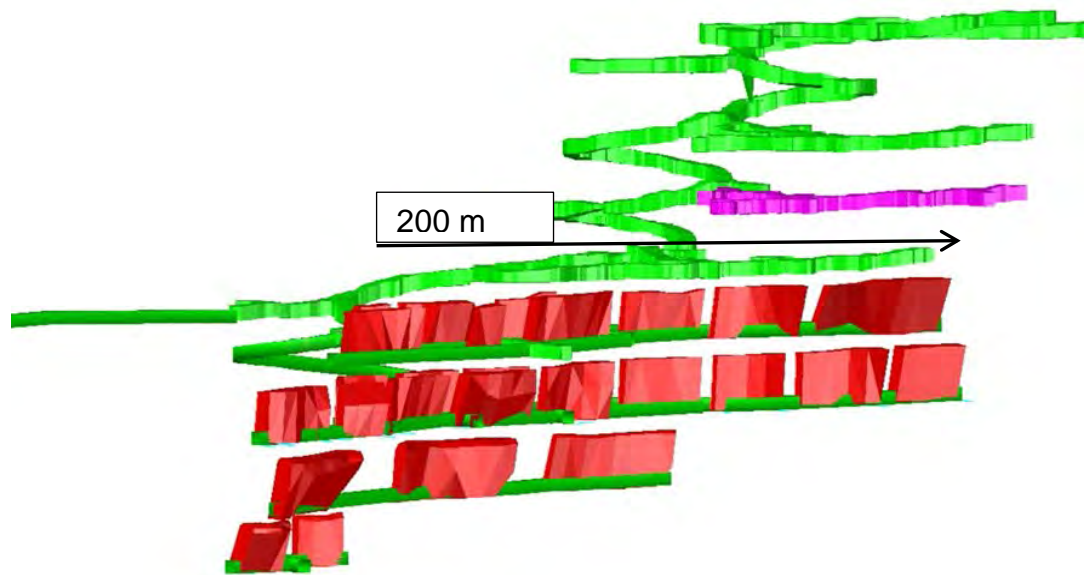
Smoke Deep vertical longitudinal section. (looking north)
